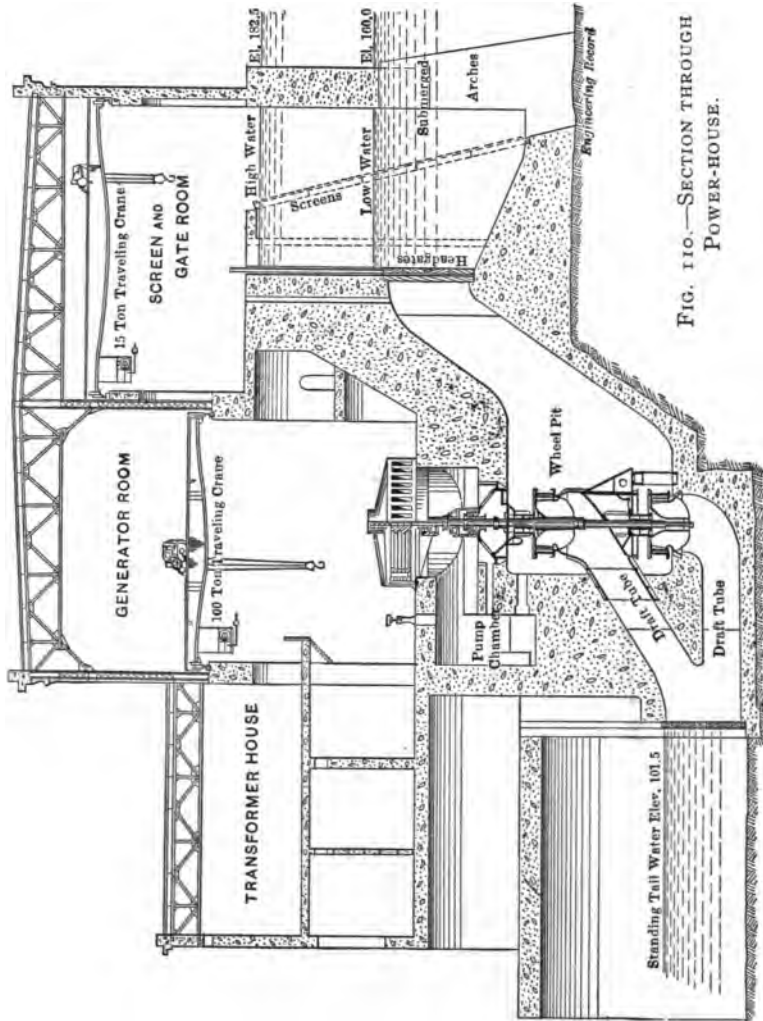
SECTION THROUGH POWER-HOUSE.
